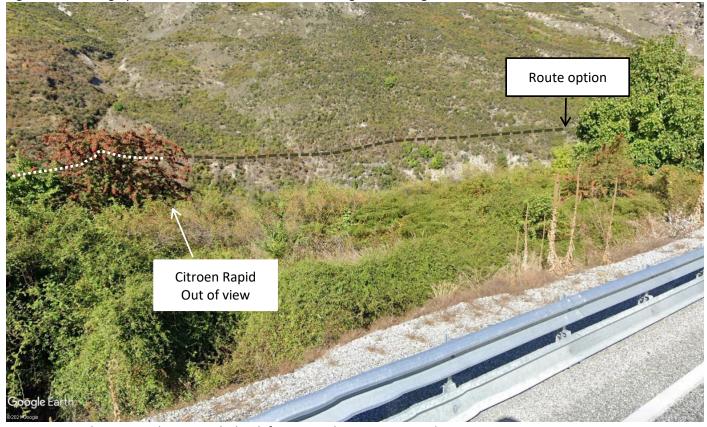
Looking towards True Right bank from SH6 above Citroen Bridge
